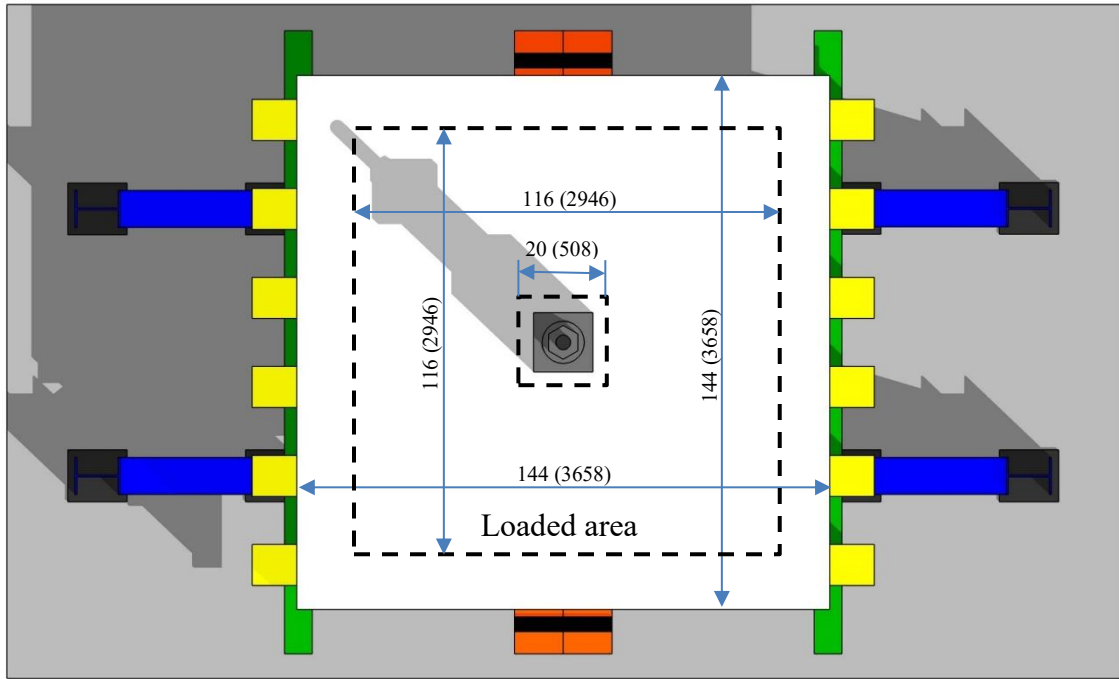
Uniform Load Test Setup. Top view, parts and dimensions [in (mm)].
